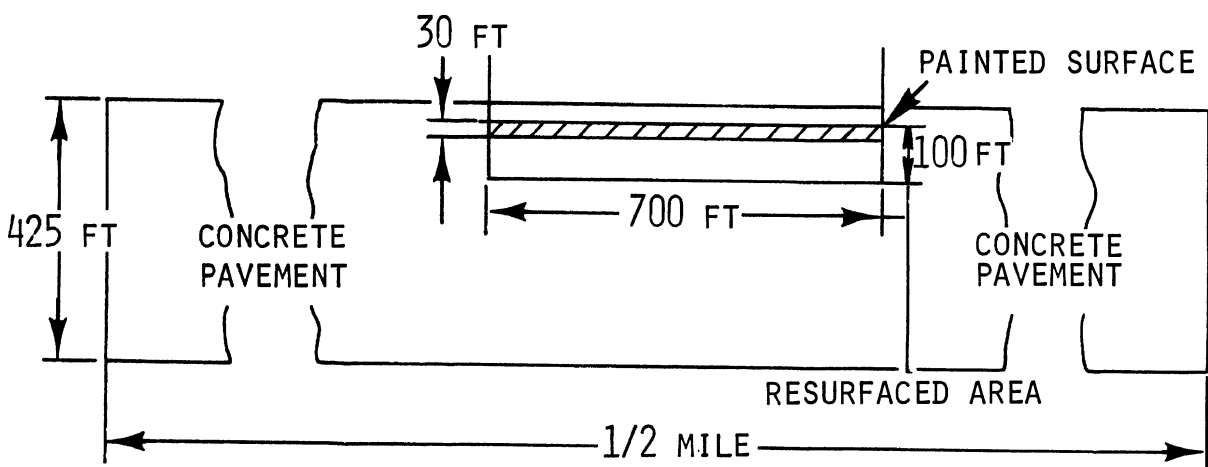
VEHICLE TEST FACILITY - - EAST RAMP, WILLOW RUN AIRPORT
